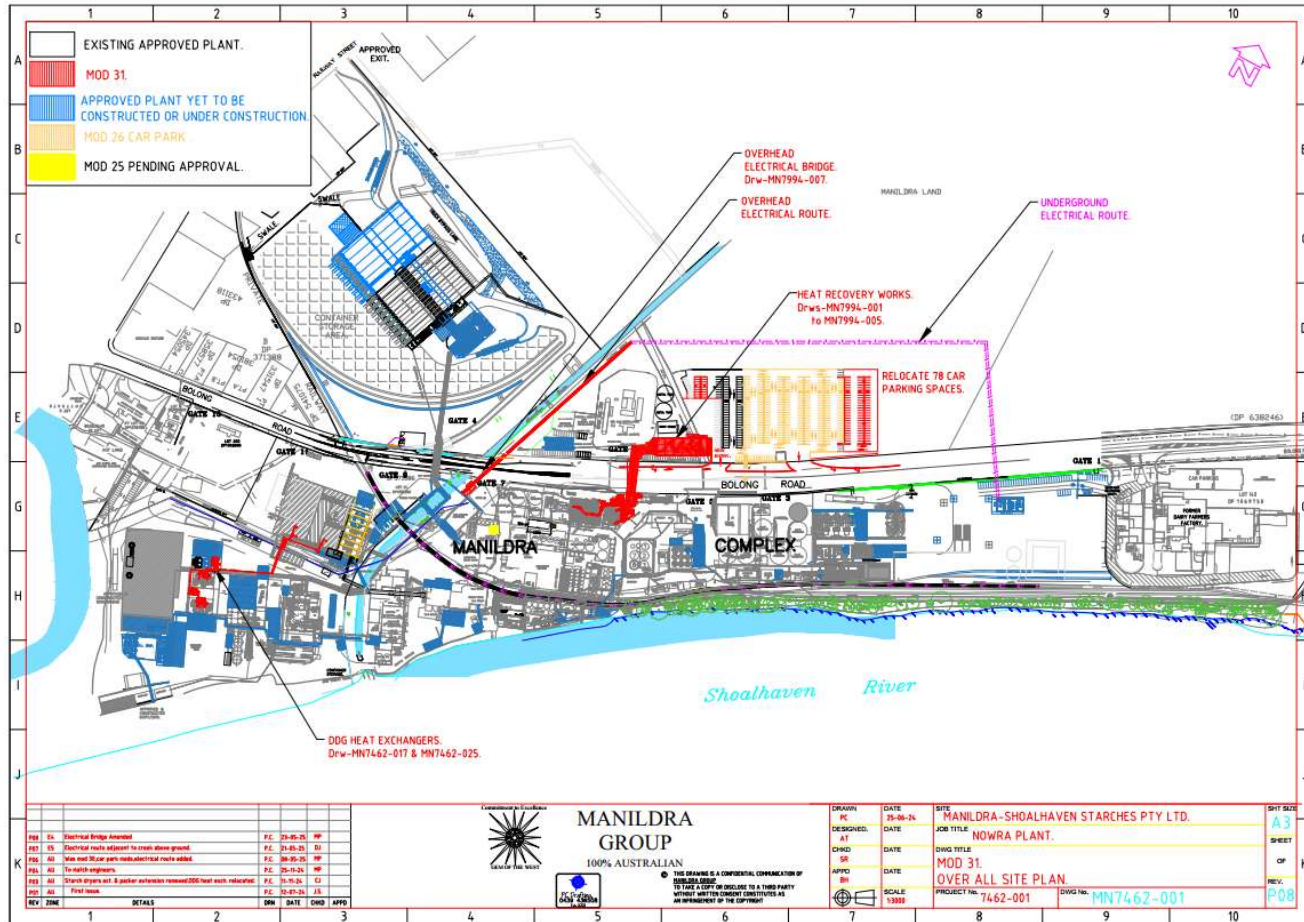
Overall Site Plan of proposed works associated with Modification Application (Source: Shoalhaven Starches Pty Ltd)
